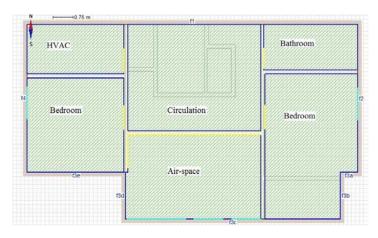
Floorplan of baseline building, first floor, zoning in IDA ICE
